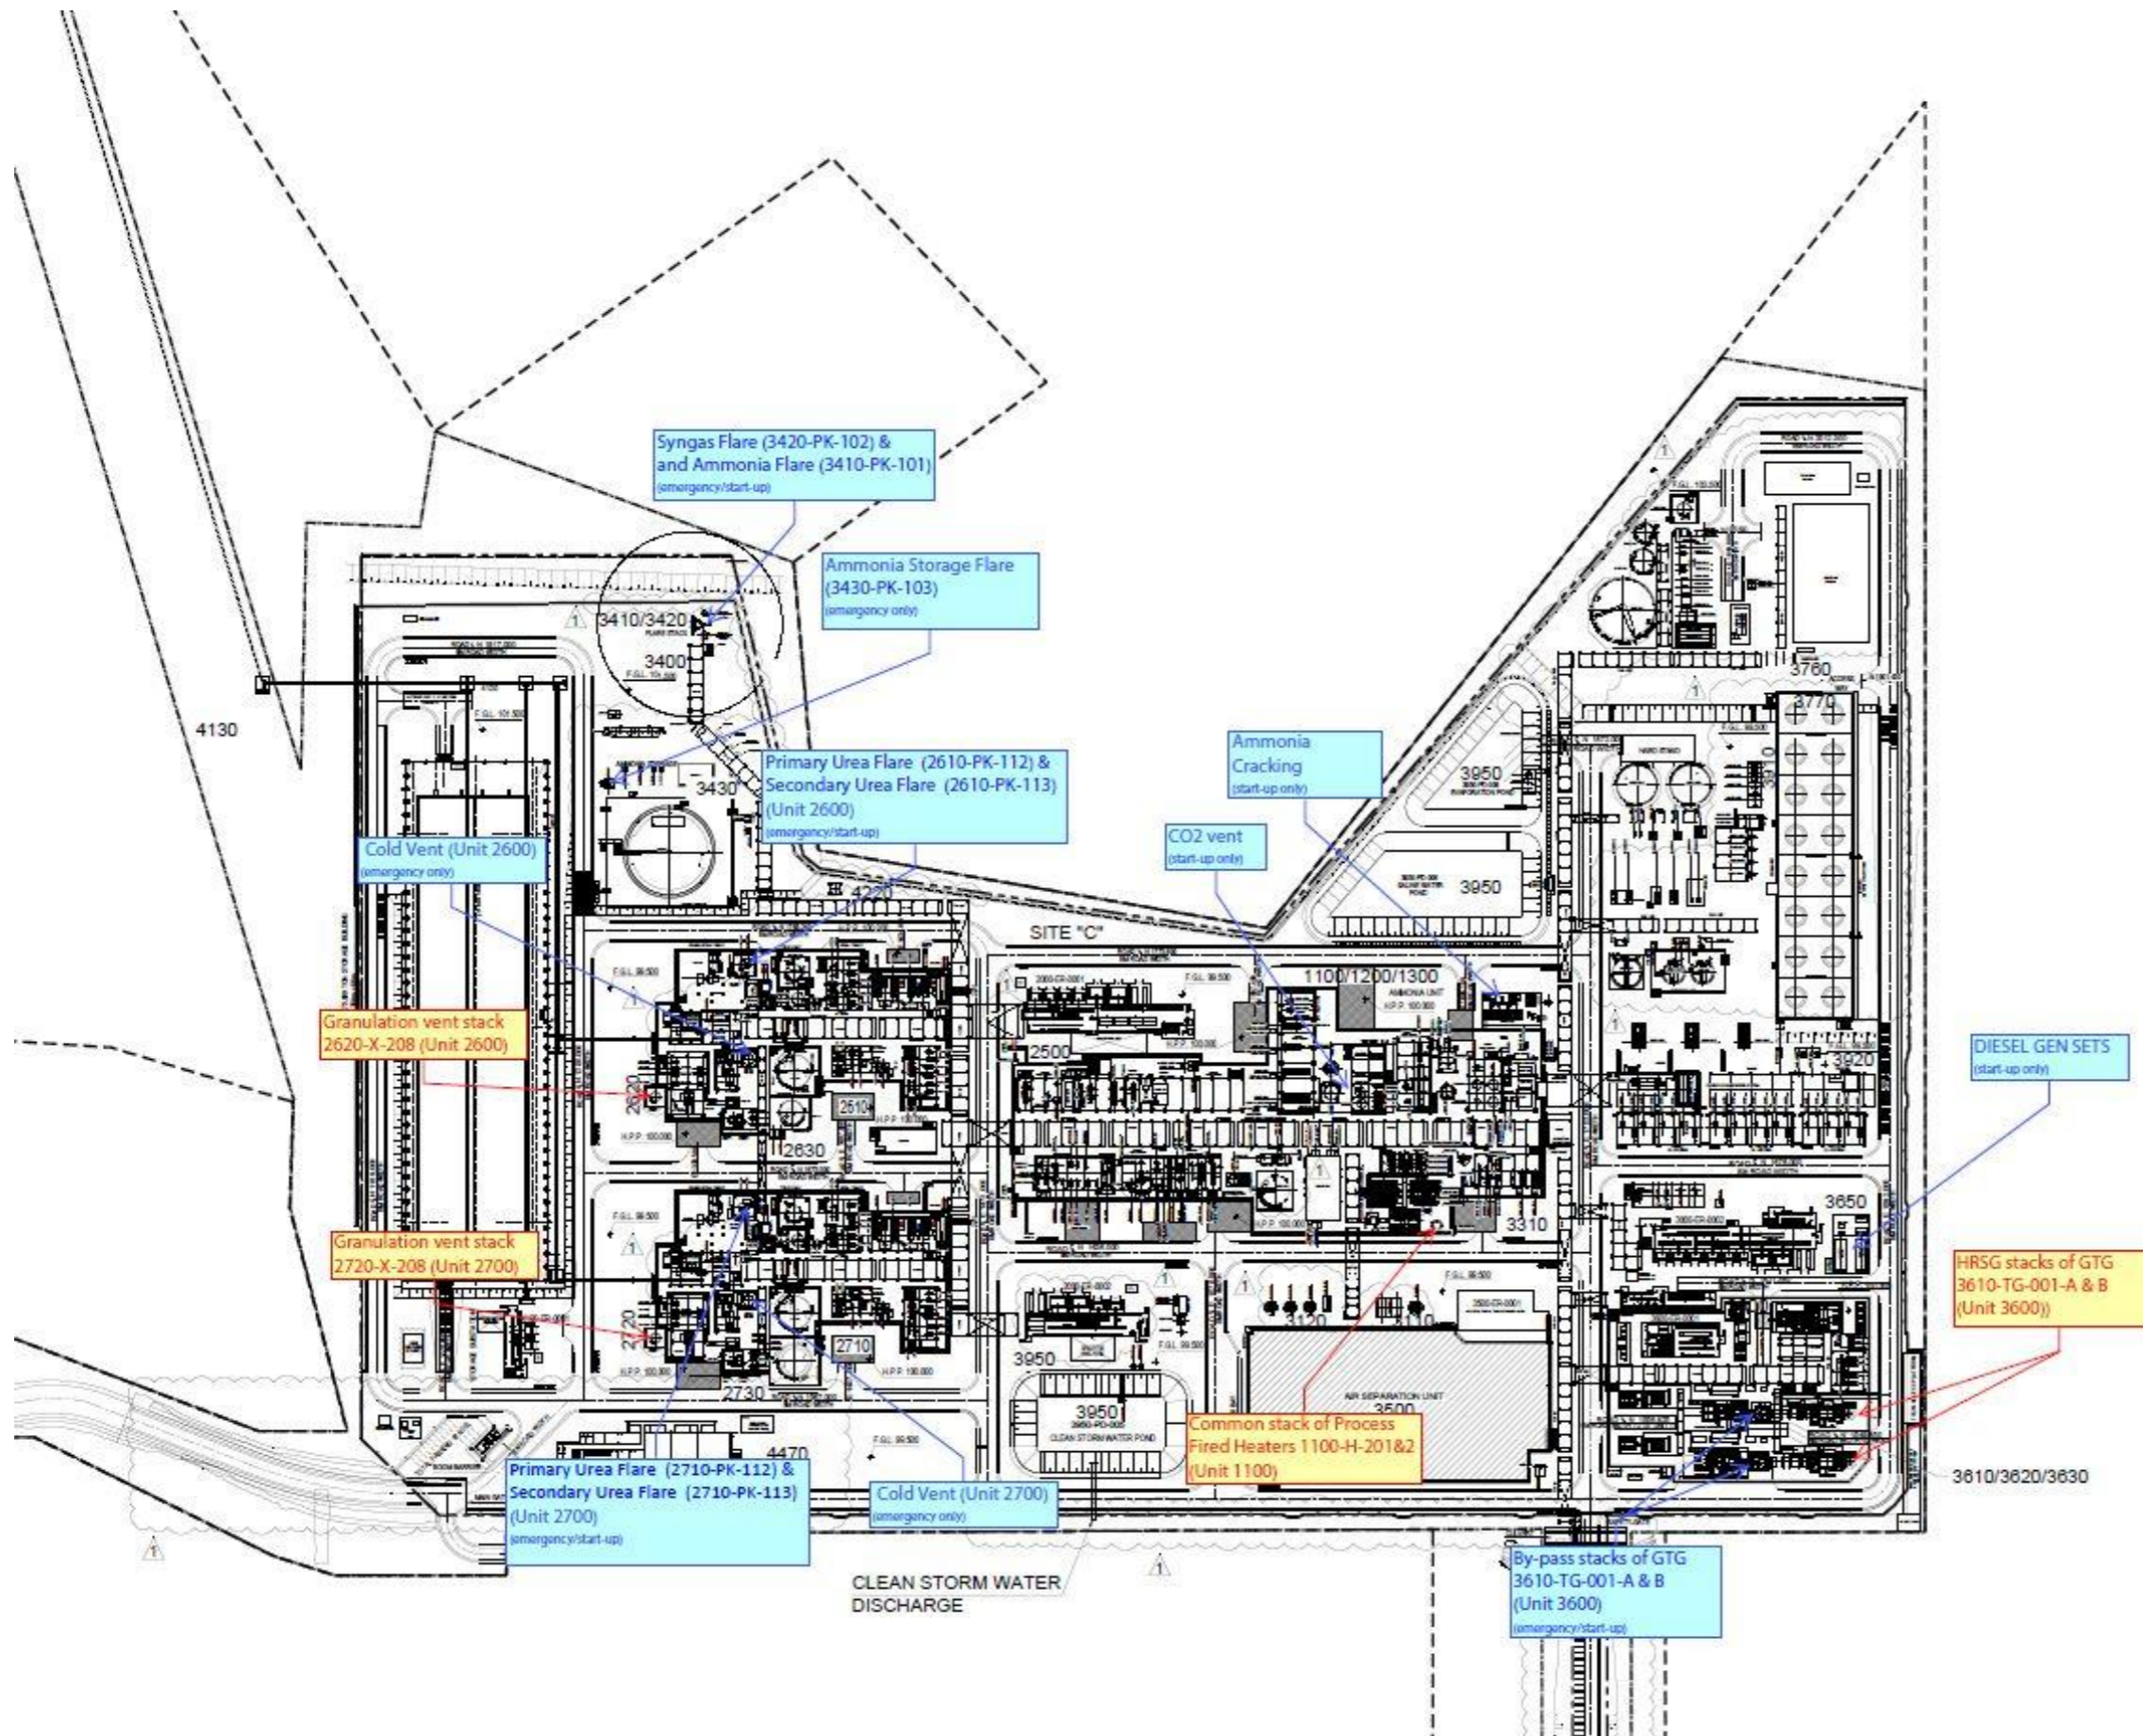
Site C - Plan showing the location primary process infrastructure, exhaust stacks, vents and flares
